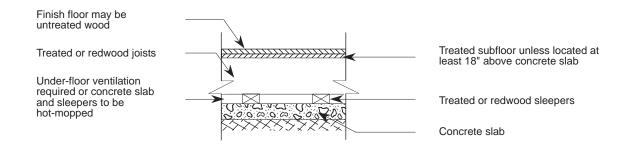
/Raised wood floor on wood sleepers over $3^1/_2$ -inch-thick minimum concrete slab with waterproof membrane
